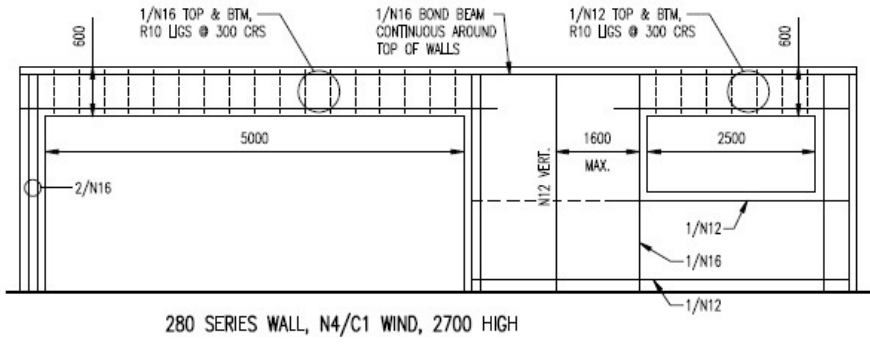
2700 High Wall, N4/C1 Wind Rating, 280 Series ECO-Block (Max. roof load width: 9.2m)
